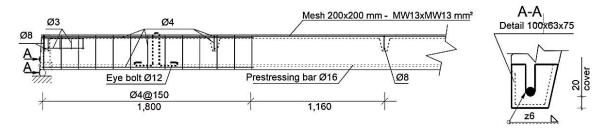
Reinforcement and anchorage of the ribbed panel PNS-12 (PK-01-111, 1961). *Dimensions are in mm*.
